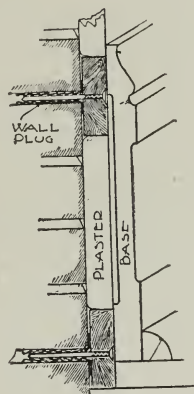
The Rutty Steel Wall-plug. Face Flush with Masonry.
